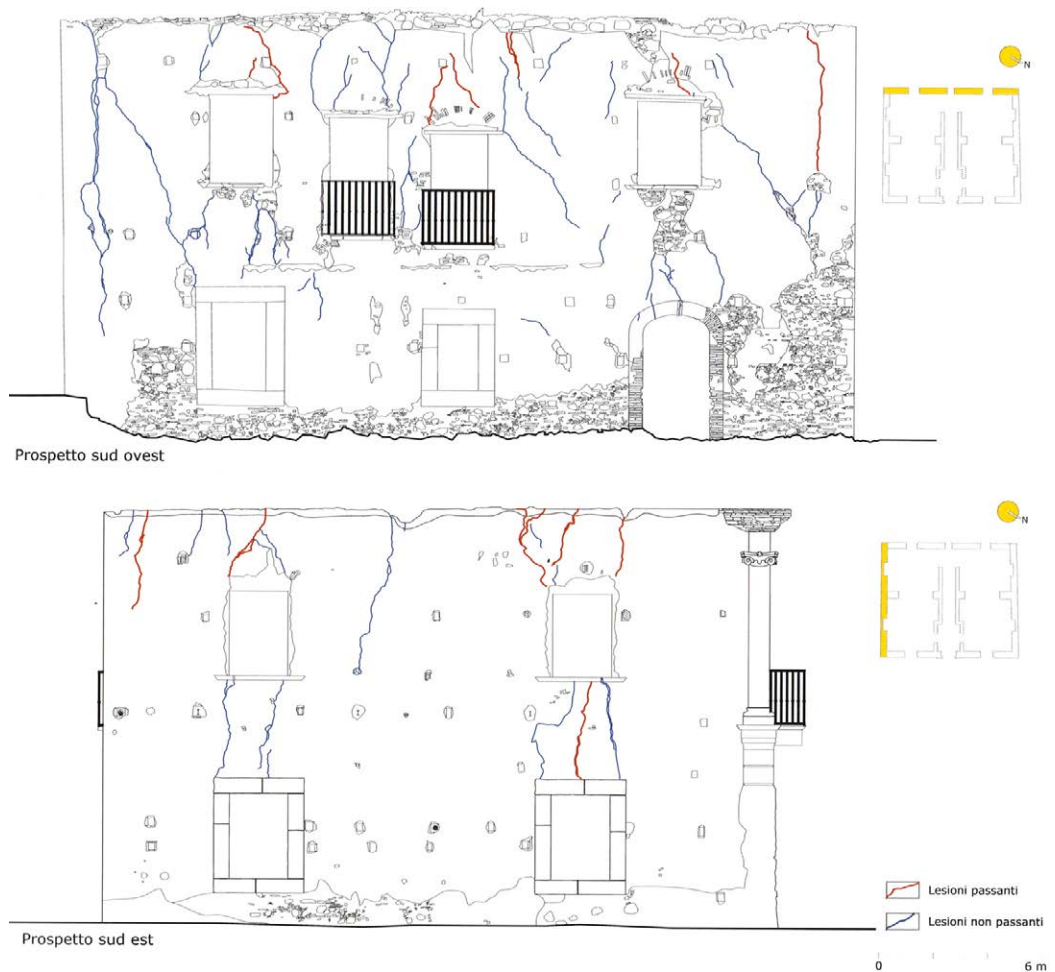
Portanova Palace, Reggio Calabria. Southwest and southeast elevations, crack framework [Valtieri 2016, p. 78].
